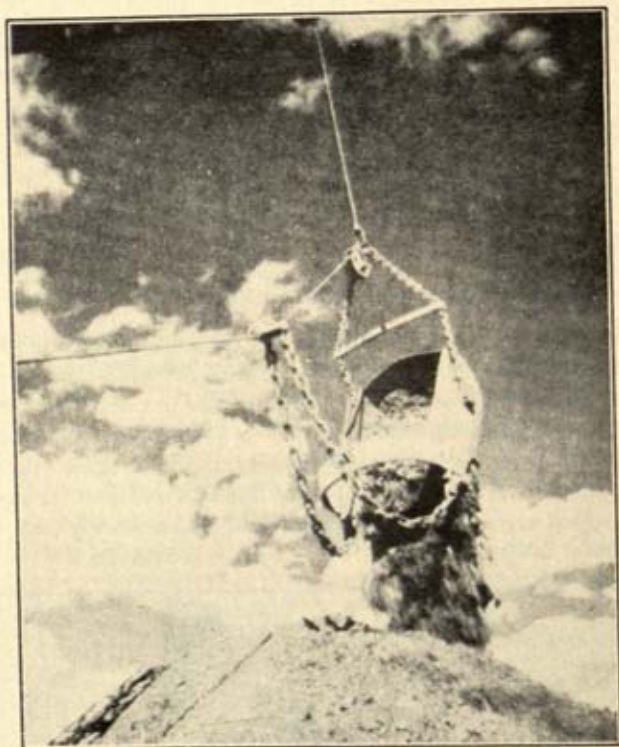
Dragline bucket dumping its load. (Page Engineering Co.)
